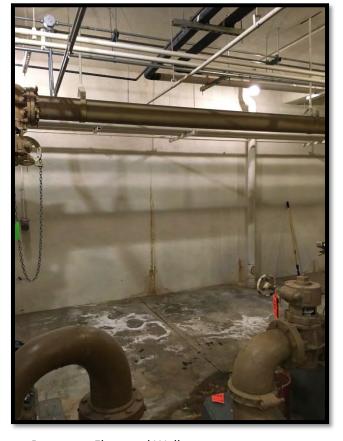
A&B, Aerobic Digester Concrete and Wall Cracks (Truck Sludge Loading)
